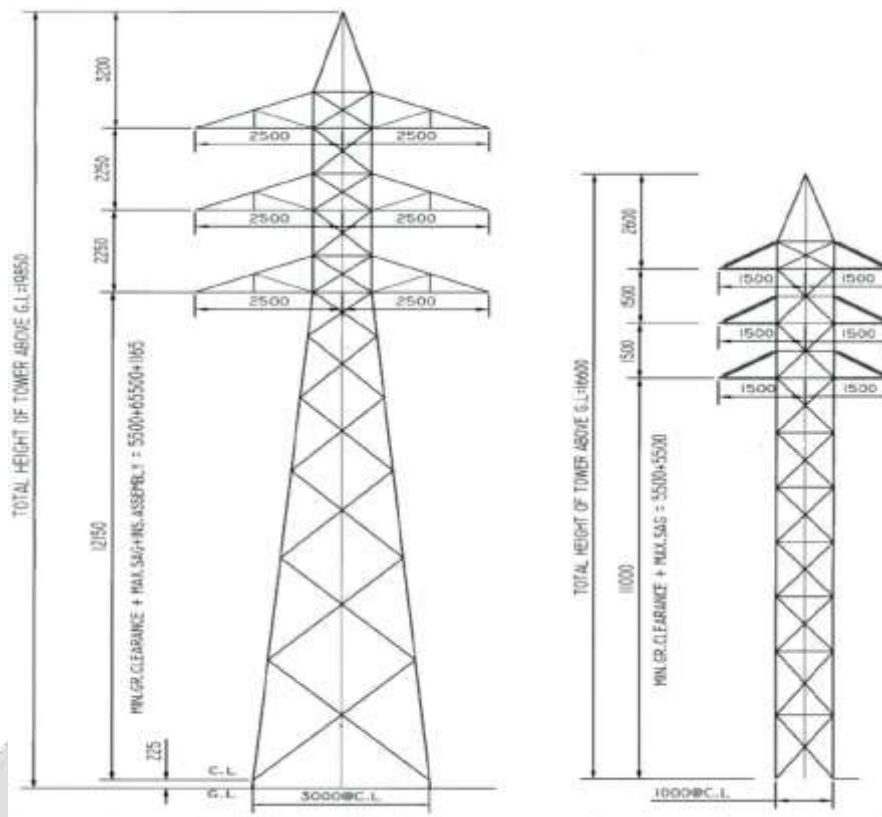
(a) Conventional steel tower; (b) Proposed tower with composite members
